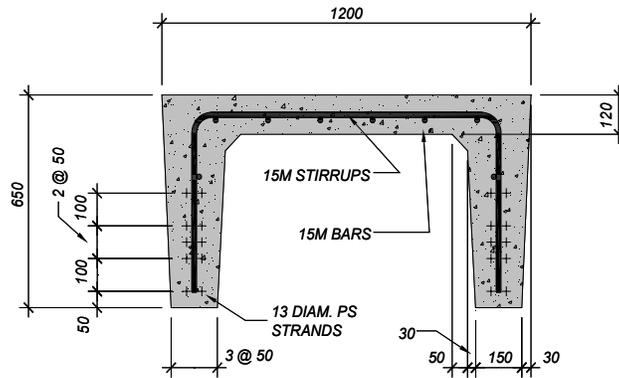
Typical cross-section of full-scale pre-stressed concrete bridge girder (all dimensions shown in mm)
